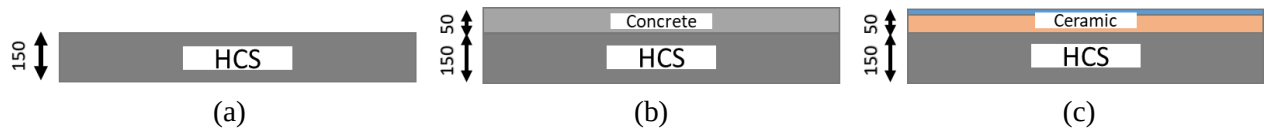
Details of HCS Floor Slab Section Variation, (a) HCS without Topping, (b) HCS with Reinforced Concrete Topping, (c) HCS with Ceramic Topping (mm).
